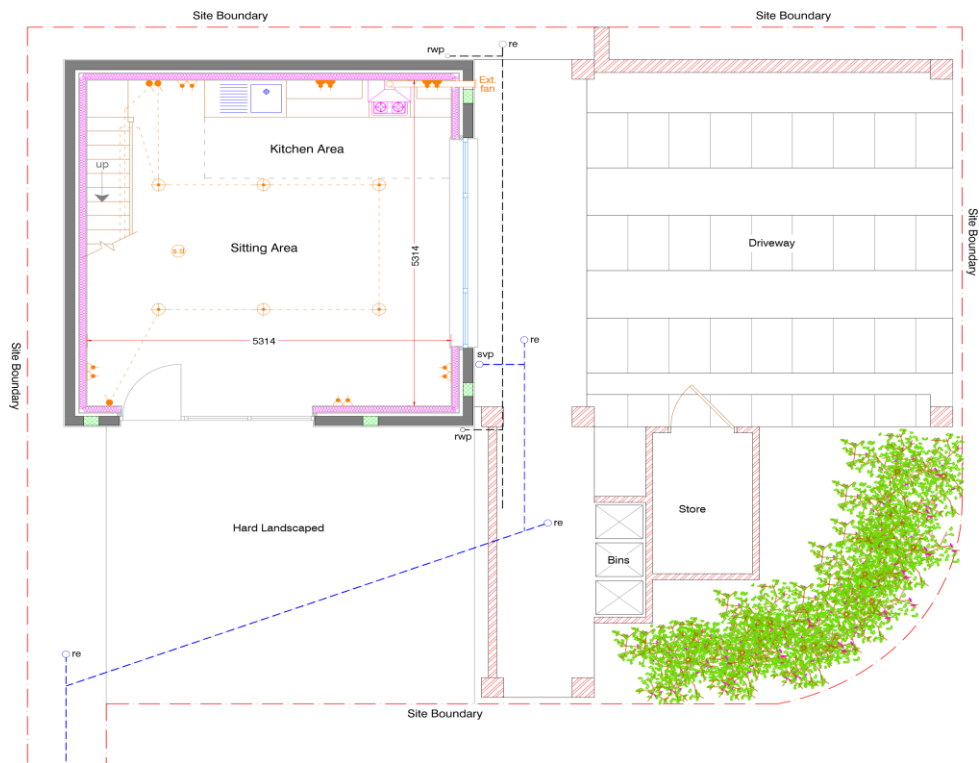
10/01898/FULL Approved ground floor plan.
